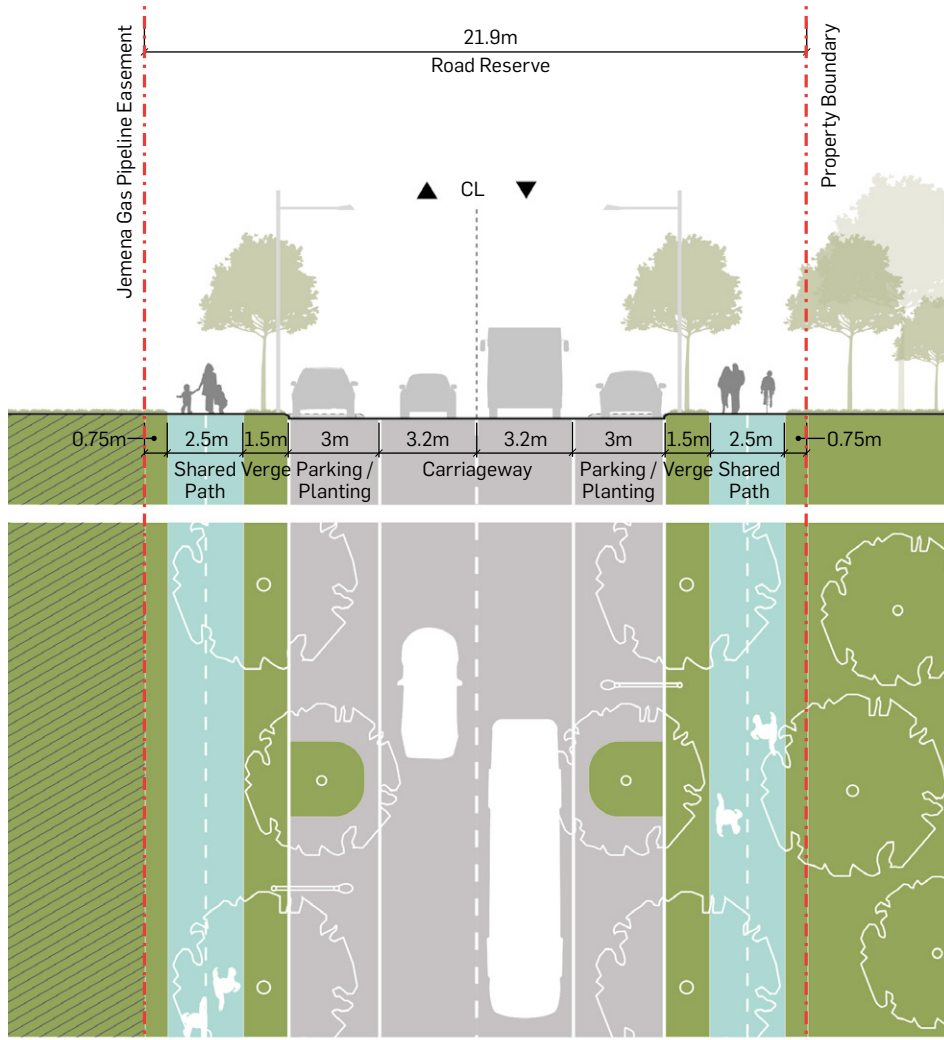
Indicative Street Section B-B' - Major Collector Road - Type 3
